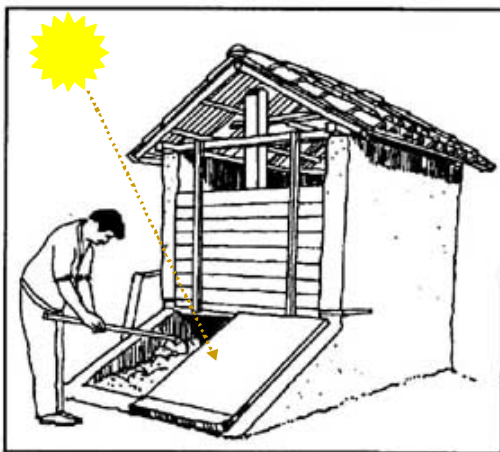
Double vault toilet with solar heaters (from Esrey et al., 1998)
